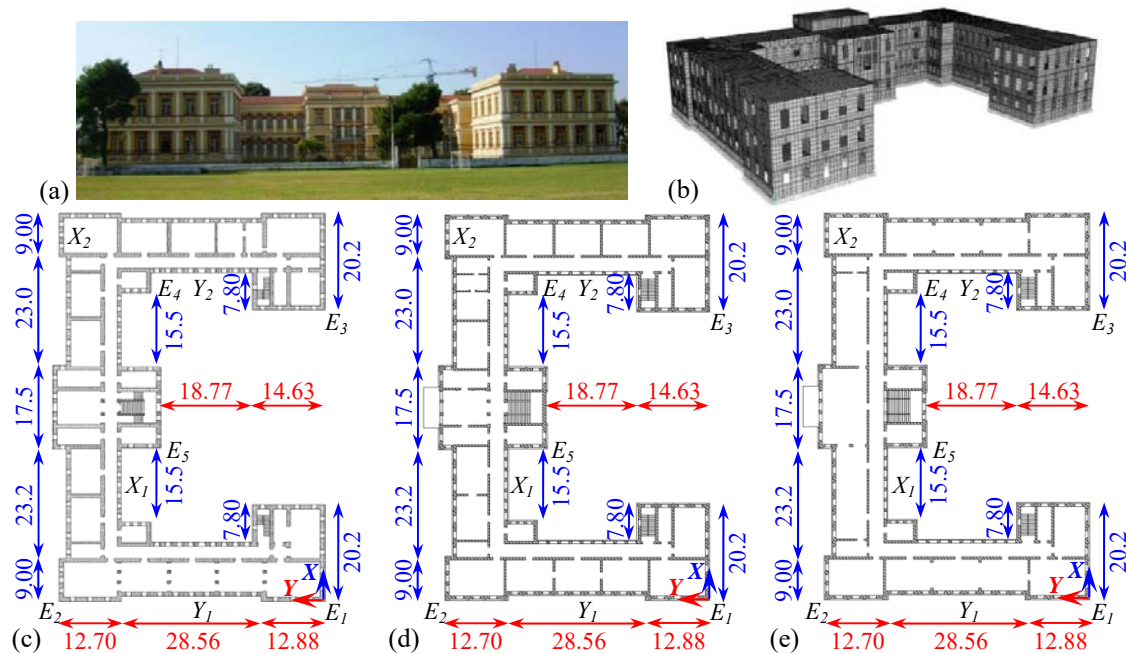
The Papafeion Foundation: (a) North view, (b) 3D finite element building model, (c - e) 1st, 2nd and 3rd storey plan views, respectively
